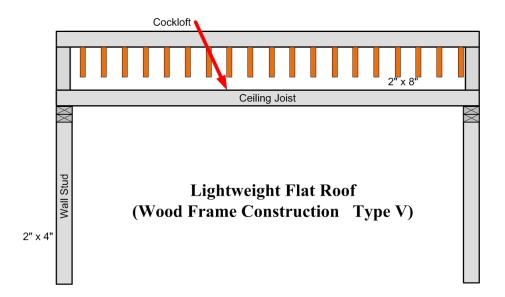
A Cockloft is the Void Space between the Ceiling and the Flat Roof
